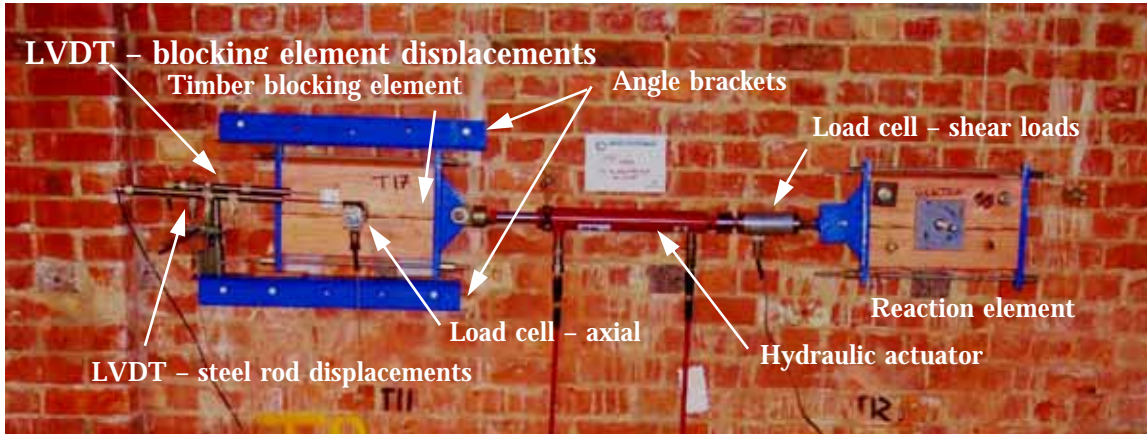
Typical test setup details for in-situ testing of wall-to-diaphragm shear transferring connections in an existing clay brick URM building
